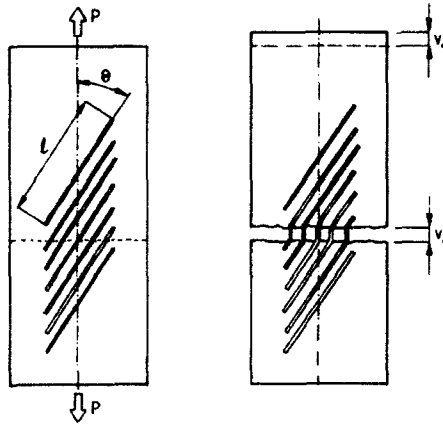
Fibre reinforced (1D) concrete element subjected to axial tension before and after the crack opening (Example 1, after Ref. 1).
